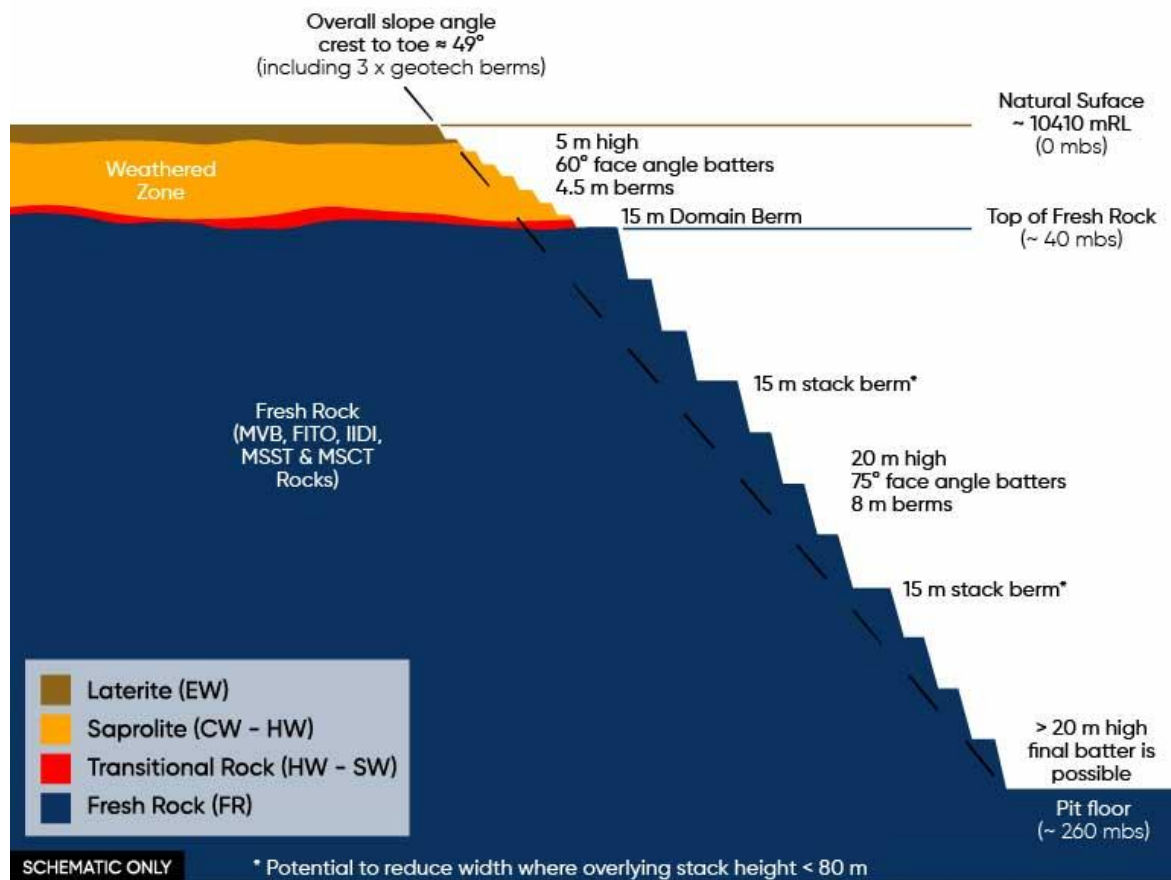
NEB Pit Domain B Wall Design Parameters
